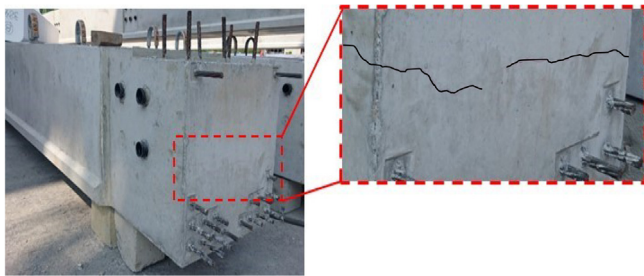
Location and pattern of horizontal end cracks in hollow-type girder.
